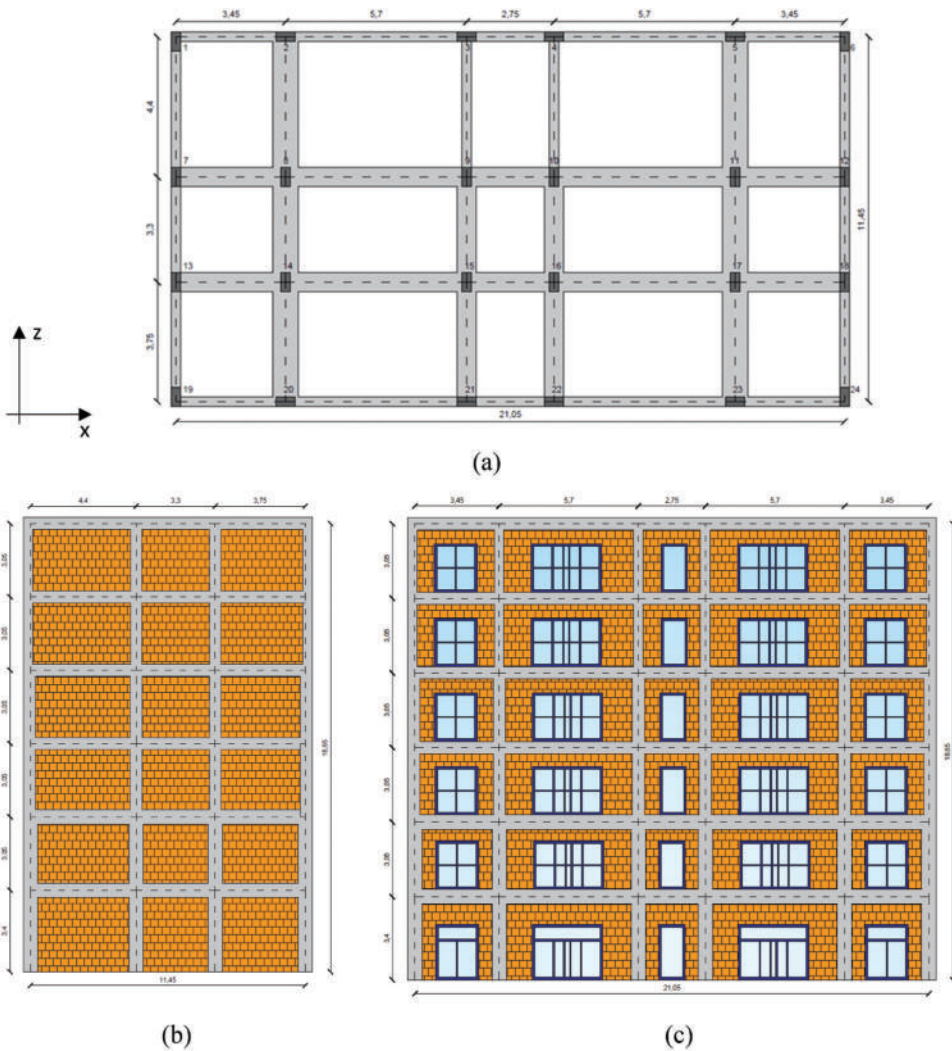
Case Study: (a) floor plan; (b) Short side elevation; (c) Long side elevation.
